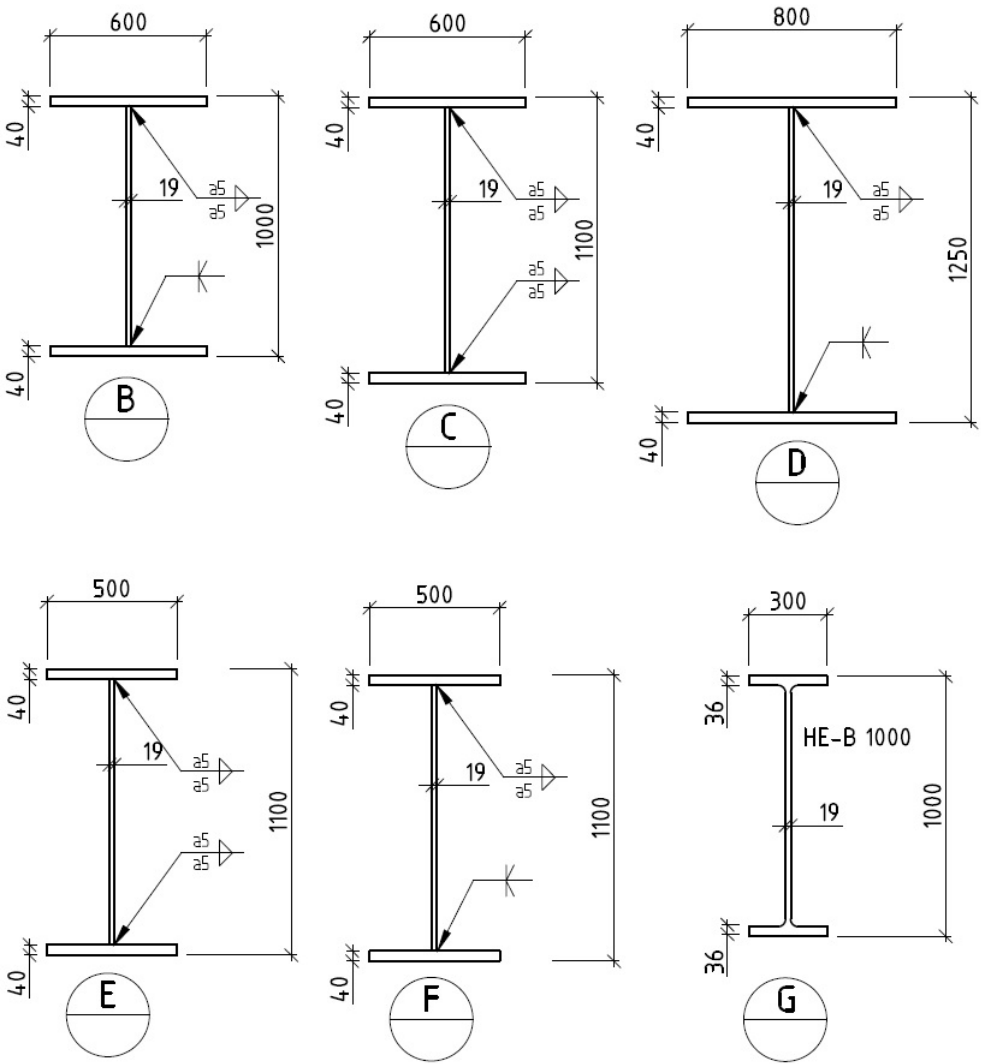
Cross section of the steel beams along Bårdshaug Bridge at
